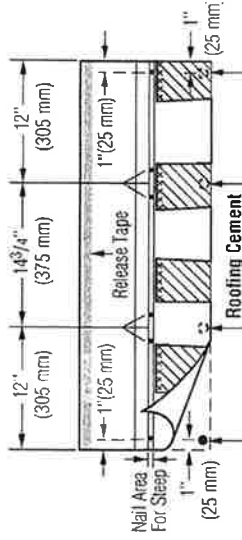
Use six nails and four spots of asphalt roofing cement on steep slopes.
